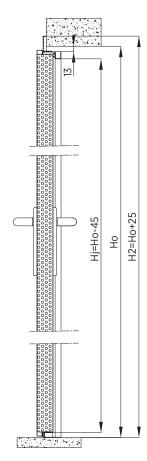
Installation of the ECO BASIC UNI 40 door with a corner frame – vertical cross-section.
